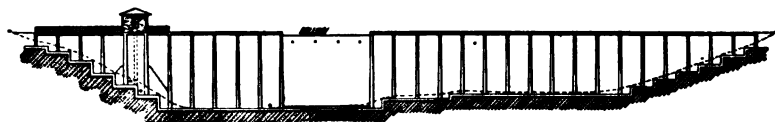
LONGITUDINAL SECTION OF PITTSFIELD DAM, SHOWING PIERS AND STEPPED FOOTINGS ON SLOPES.
